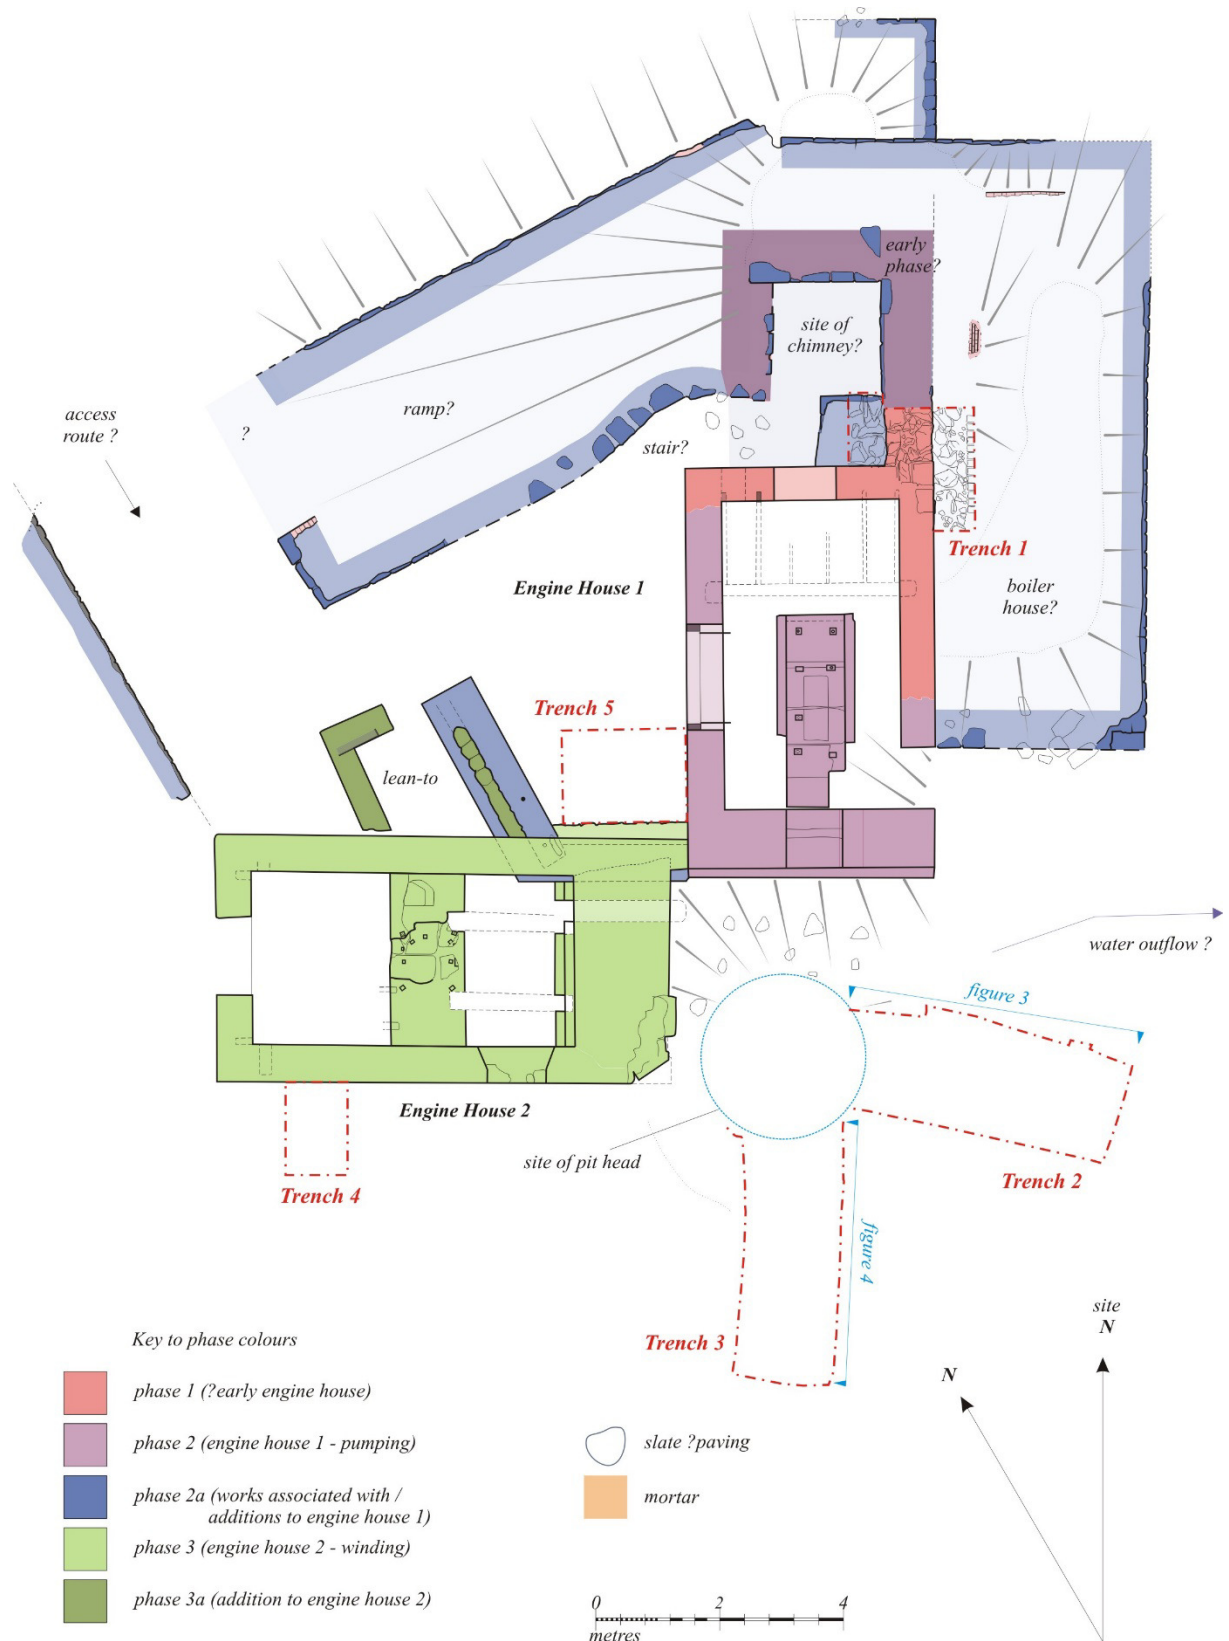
Moss Pit Engine Houses. Site plan with trench locations
